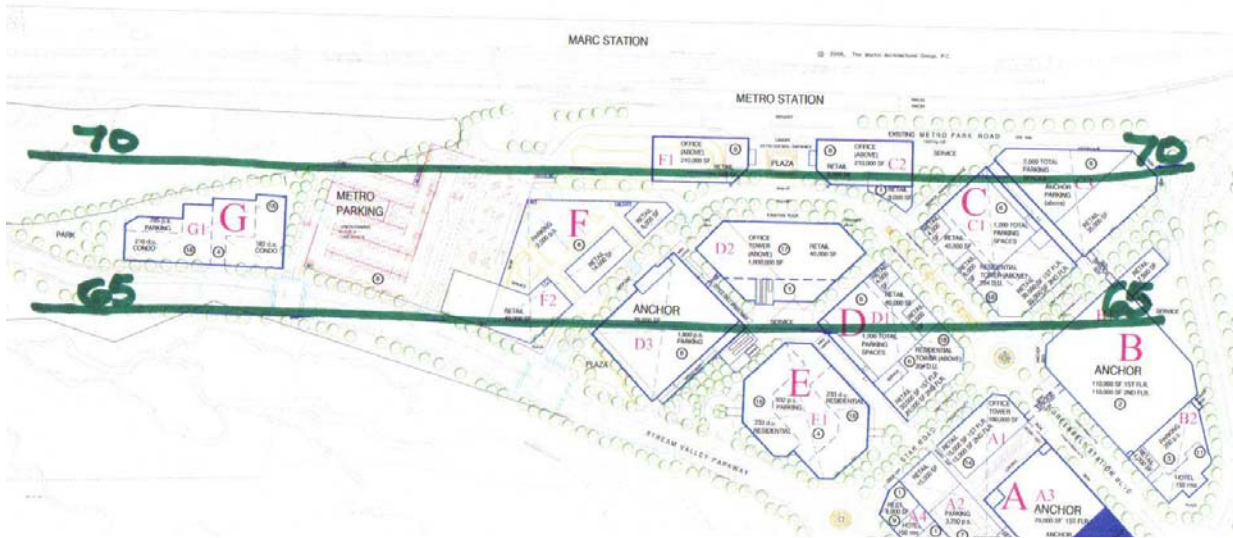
Railroad DNL at Facades of Residences on 18<sup>th</sup> Floor in the Absence of Buildings
